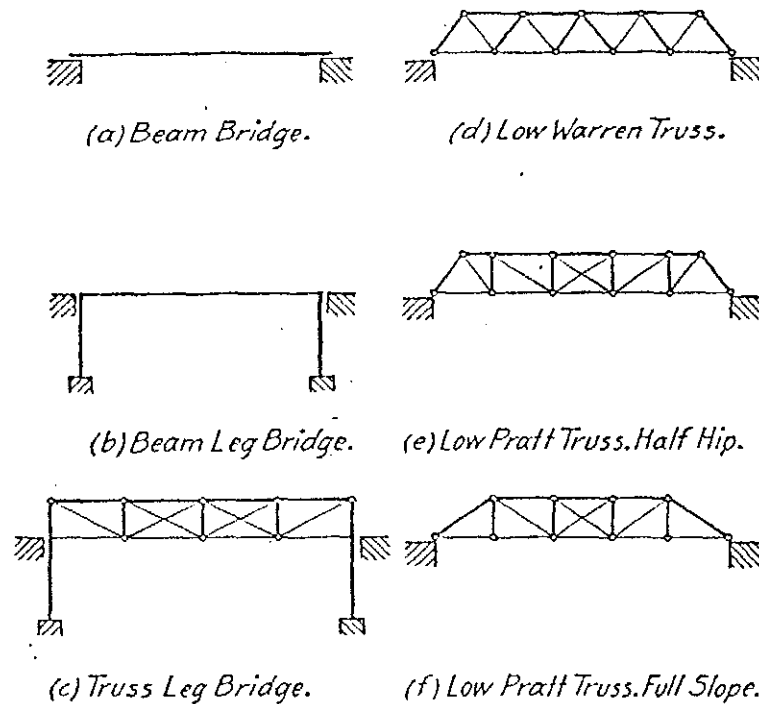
A 1912 illustration of simple-span bridges. Sketches (e) and (f) are common Pratt truss designs. Mitchell's Mill Bridge is similar to that shown in sketch (e). From Ketchum, Design, p. 5.
